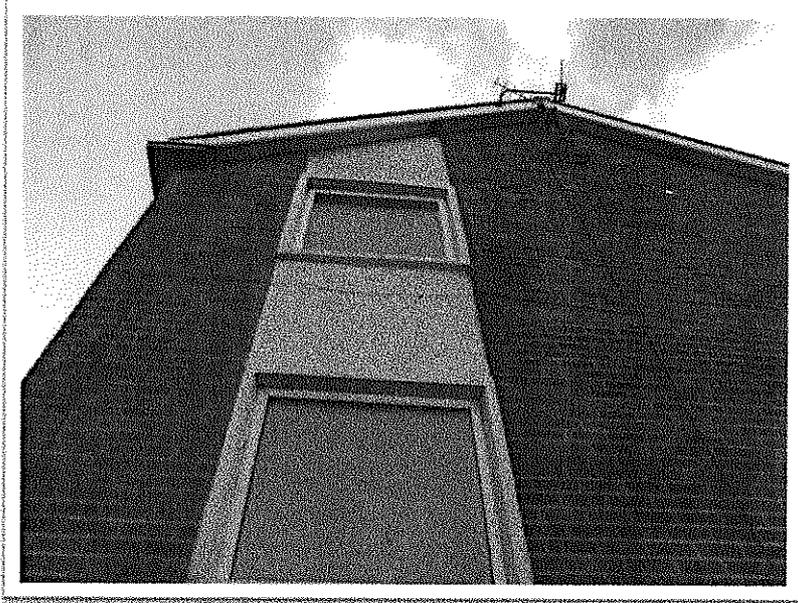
Right hand side elevation, rendered panels, loose cables, aerial brackets
